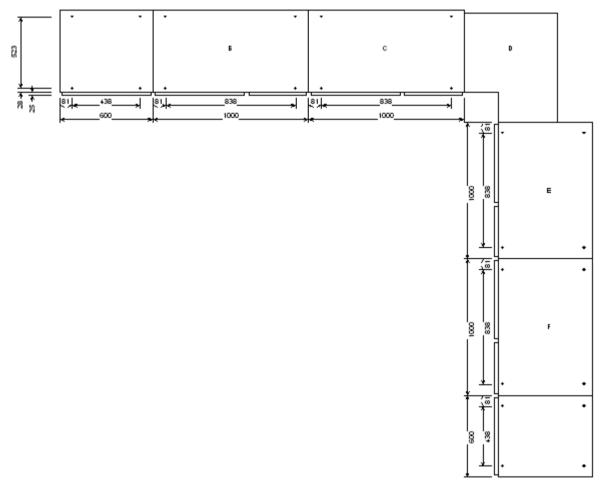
Detailed floor plan (with cable entry positions) for Power Xpert® CX switchgear with corner structure
